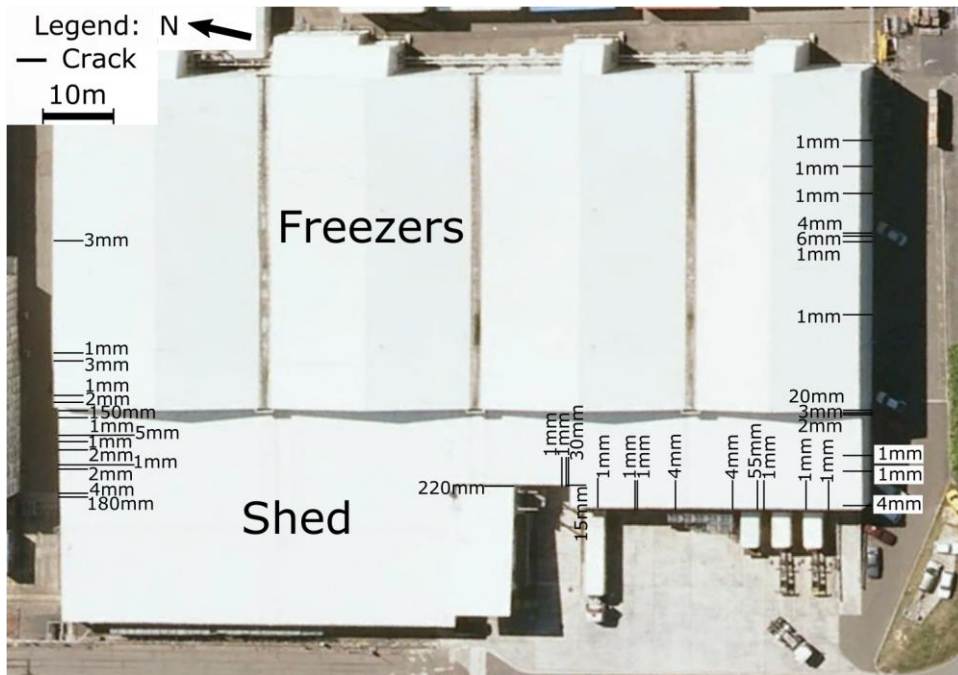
Location and width of lateral ground movement-induced cracks in the RC concrete walls at the base of the exterior building walls of the CS building. Crack openings are parallel to the respective wall.
